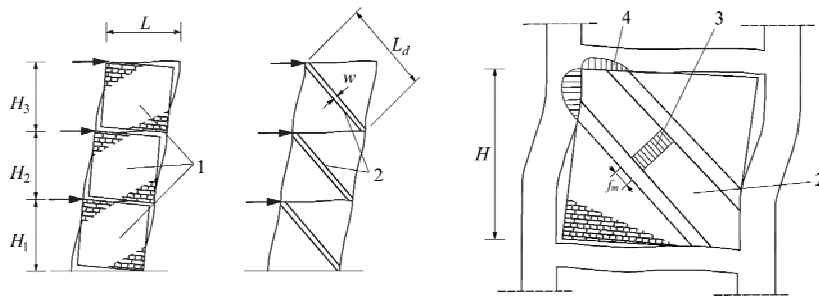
Strut model for the masonry infill wall based on [6] L, H, H_1, H_2, H_3 —wall geometry; 1—infill wall; 2—equivalent pinned strut; 3—stress distribution in the equivalent pinned strut; 4—contact stresses at corners; w —width of the strut; L_d —length of the strut; f_m —compressive strength of the masonry.
